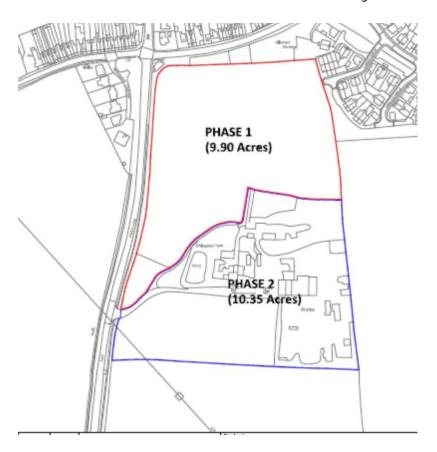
Land off Wash Lane, Coalville - Site Location Plan
